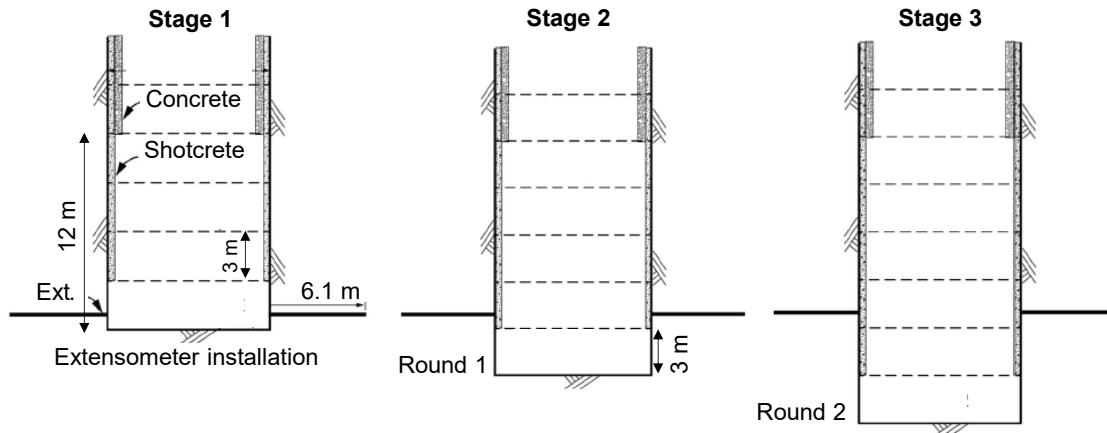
Extensometers and support installation during shaft advance (after Rafiei Renani et al., 2016)
